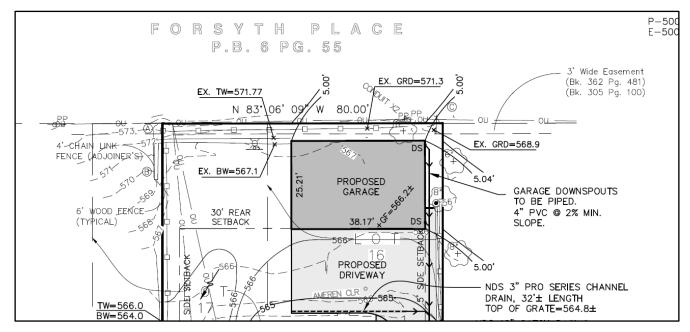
Enlarged site plan showing proposed driveway and garage, as well as 5' setbacks from both adjacent property lines.
